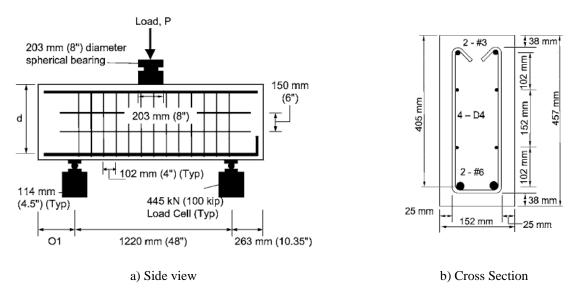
Specimen geometry, reinforcement, and test setup (Roy & Breña, 2008)
